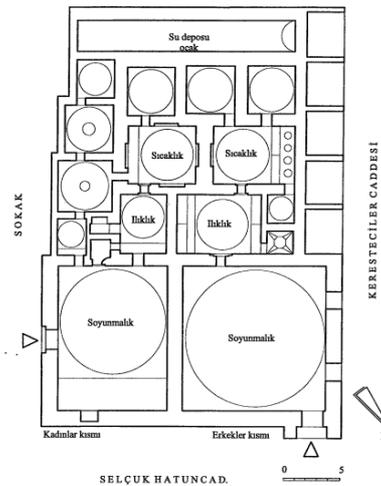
Kayhan Bath Plan (Şchitoğlu, 2000)
